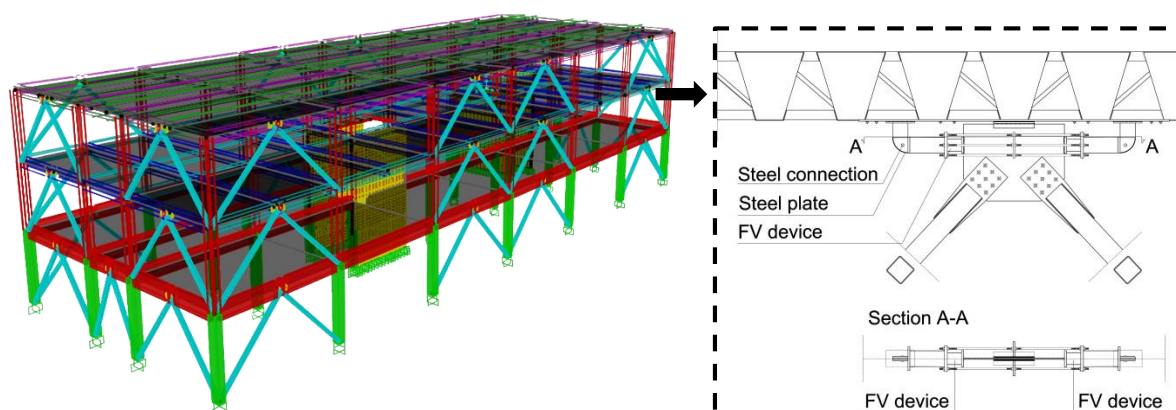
Finite element model of the structure incorporating the dissipative bracing system and installation details of the latter
